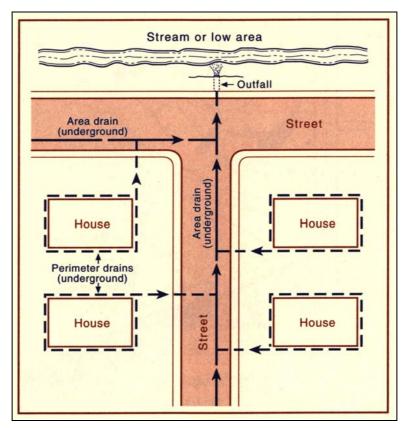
Map view of a typical area drain layout. From Noe and others (1997).
